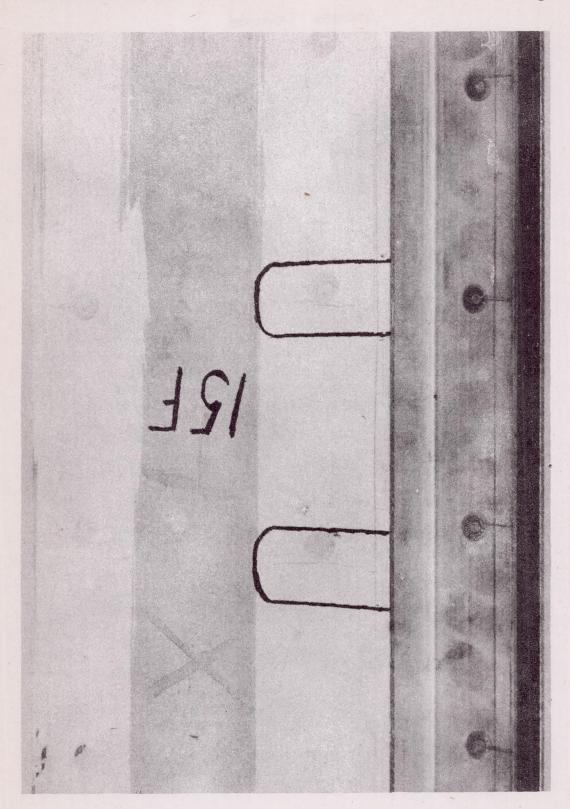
Fatigue cracks in cover plate of 61S-T girder.
